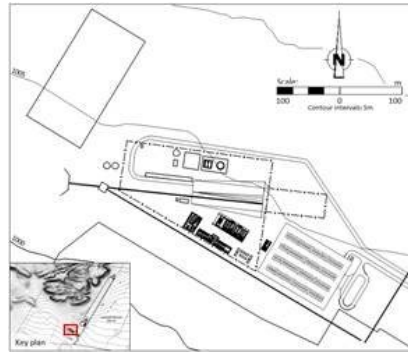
Surface Layout: South Complex (Source: Advisian)
